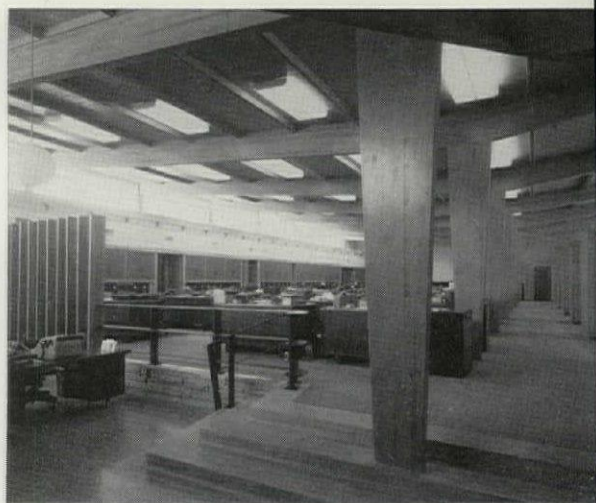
GLUED LAMINATED COLUMNS, BEAMS, AND PLANK ROOF DECK USED IN THIS MODERN OFFICE, PROVIDE, IN ADDITION TO AN EFFICIENT STRUCTURAL SYSTEM, WARMTH AND BEAUTY AS AN ADDITIONAL BONUS, WHEN USING SUCH ENGINEERED TIMBER CONSTRUCTION.
